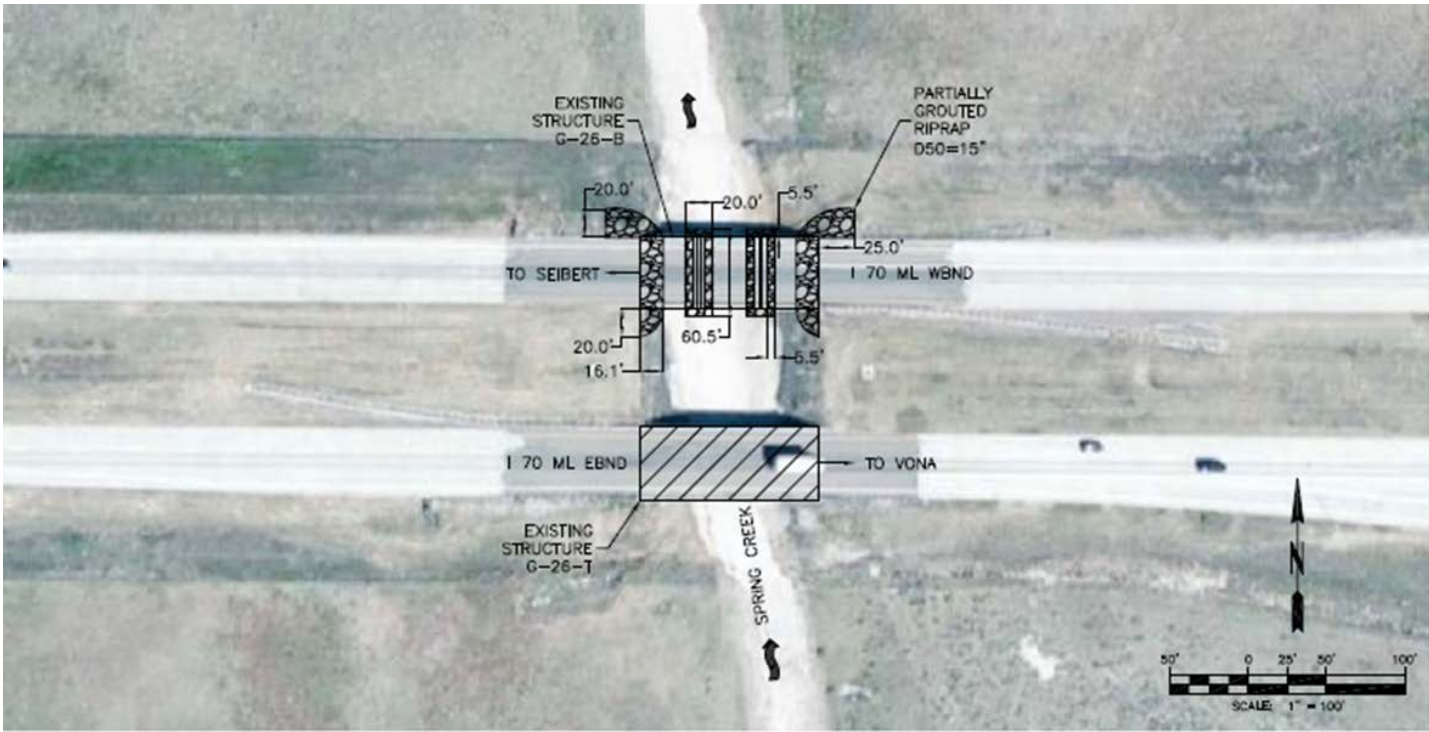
Plan view of Bridge G-26-B with recommended hydraulic scour countermeasure locations
